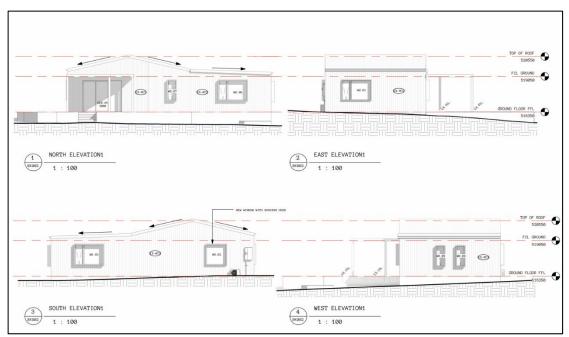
Proposed elevation plan (source: Cameron Anderson Architects)
